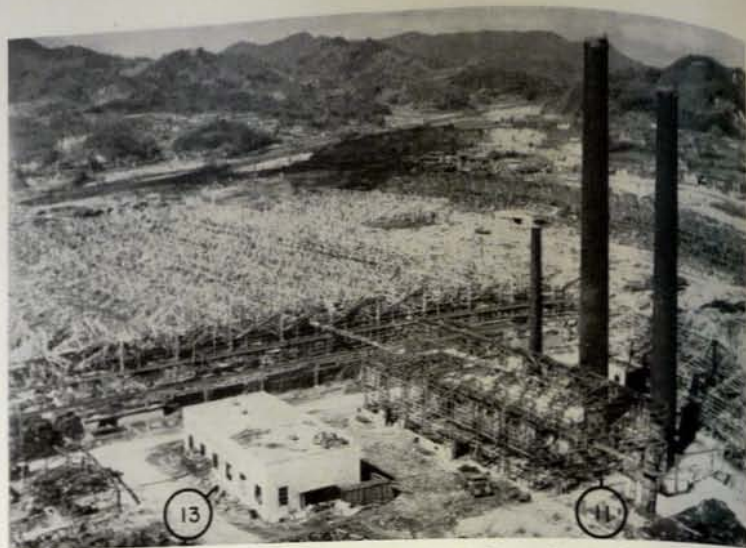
4,500 feet from GZ. Group 4. Building 22. Aerial view looking northwest. Building 11 (boiler house) in foreground.
